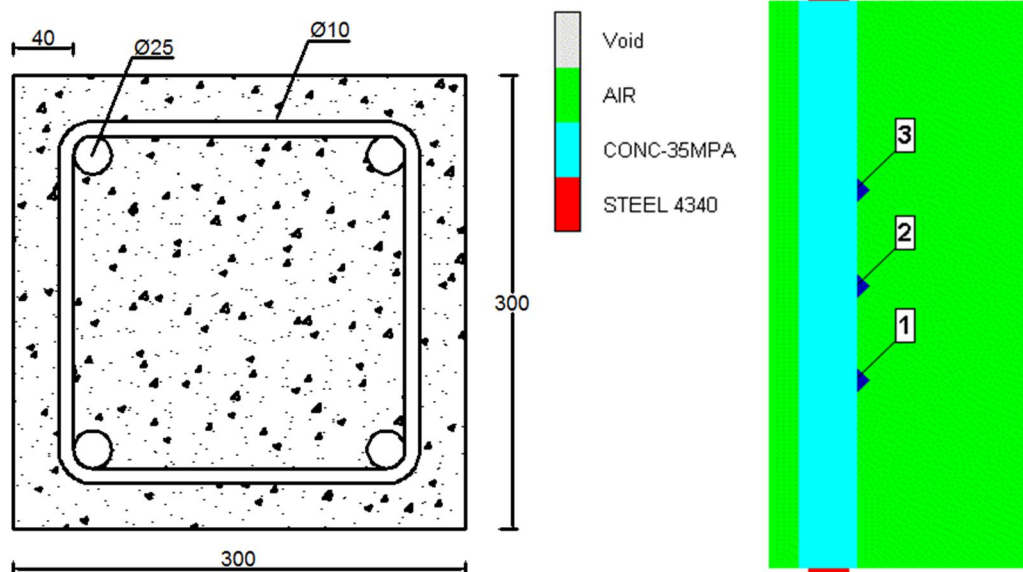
(a) Dimension of concrete column (b) AUTODYN model
